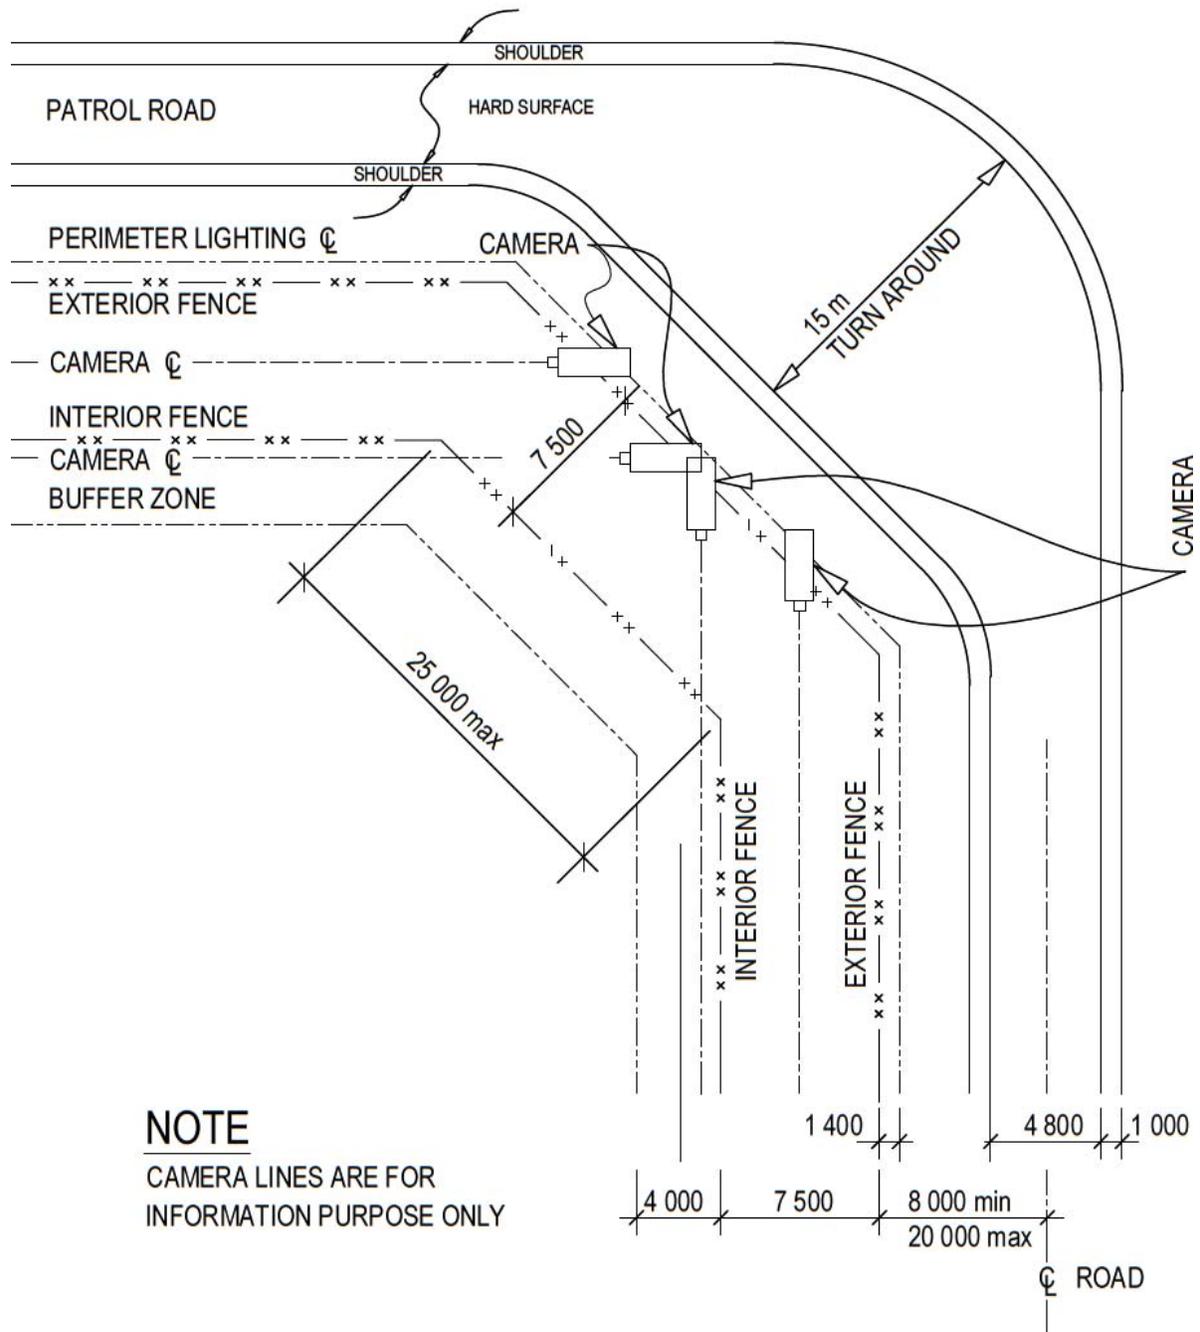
TYPICAL PERIMETER FENCE CORNER WITHOUT TOWER
